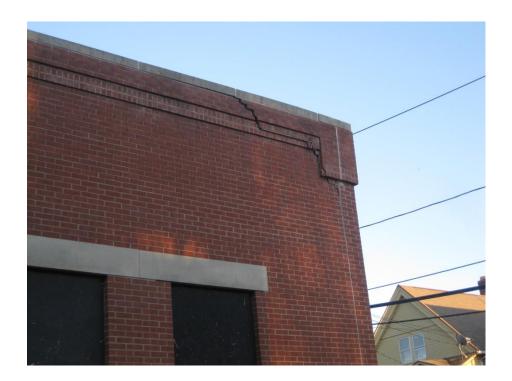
Cracked Brick at Corner of Laundry/Storage Addition
